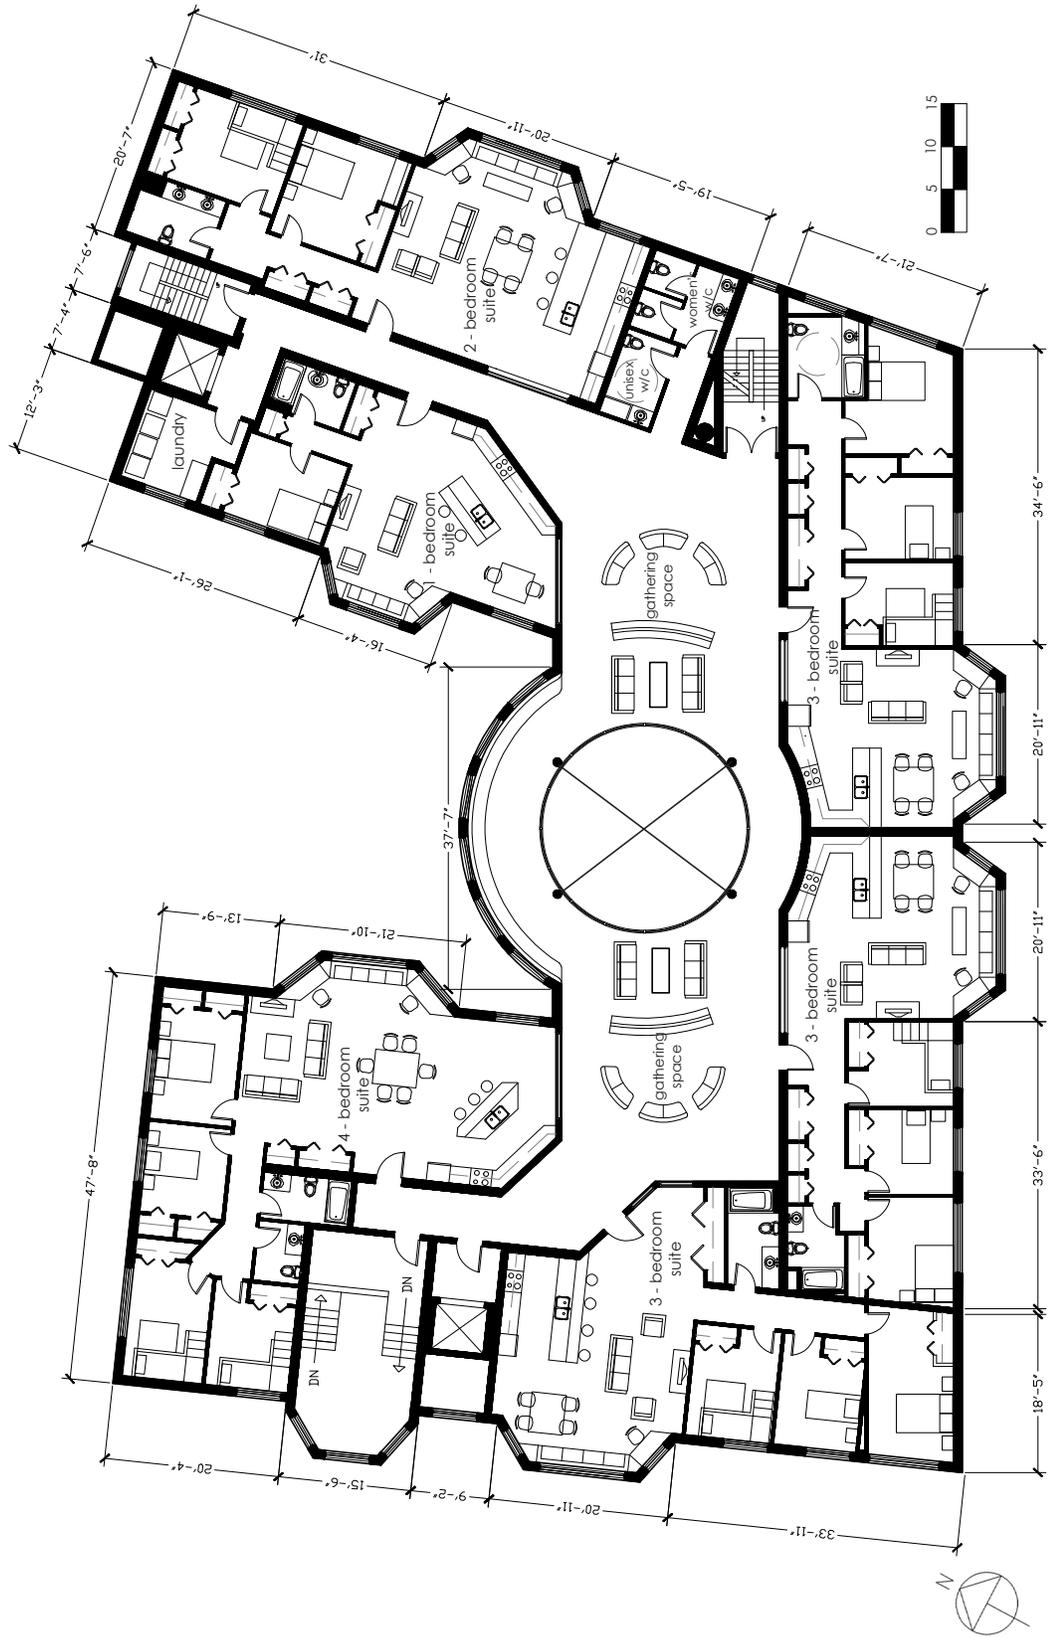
| FIRST DIMENSIONED FLOOR PLAN
